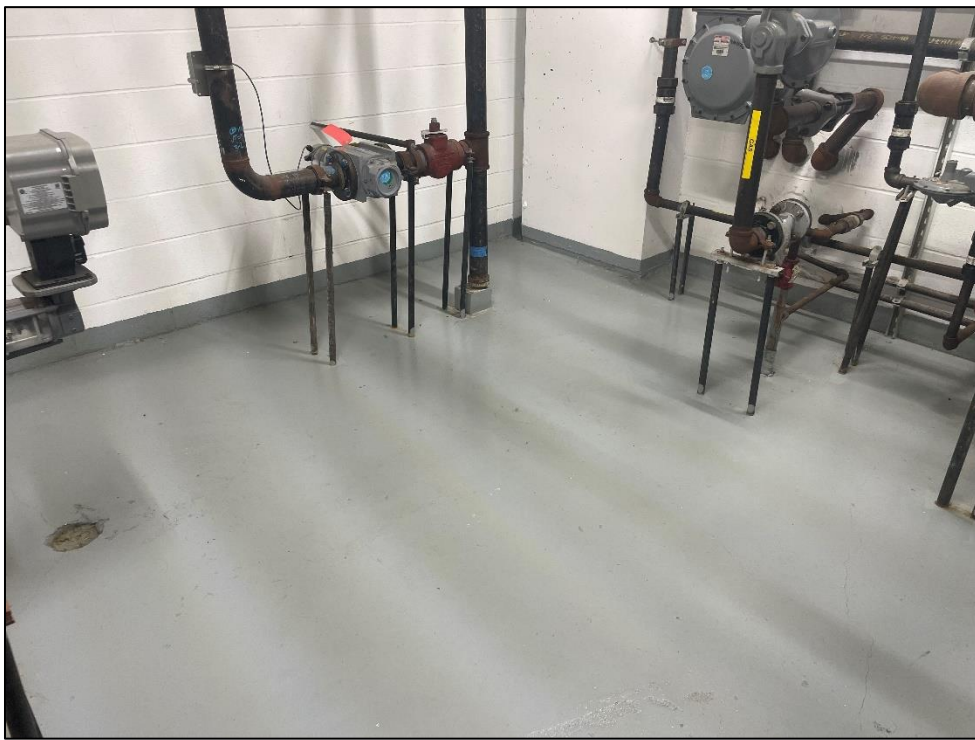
, 05/17/2023: View of concrete building slab composite cover in gas meter room (facing northeast).
